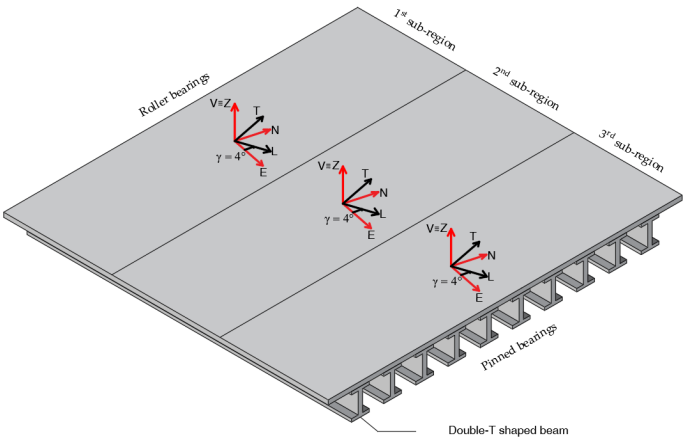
Single-span simply supported concrete girder bridge, Fiumicino, Rome (Italy) in a scale axonometric view. The single span bridge, characterized by 10 double-T beams of equal sections is divided into three sub-regions (i.e., 1st, 2nd and 3rd sub-region). The 1st sub-region is characterized by roller bearings, while the 3rd one by pinned bearings.
